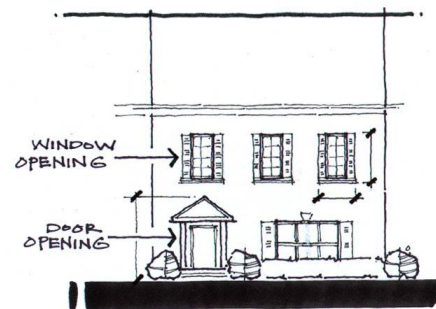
All openings should be vertically oriented to reflect a pedestrian scale but may be grouped to form larger horizontal masses. Window and door openings provide contrast to the main wall and should occupy between 15% to 30% of the facade.
